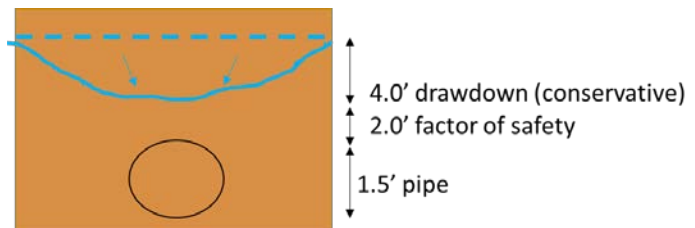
Groundwater gallery pipe cross section view showing drawdown effect.
